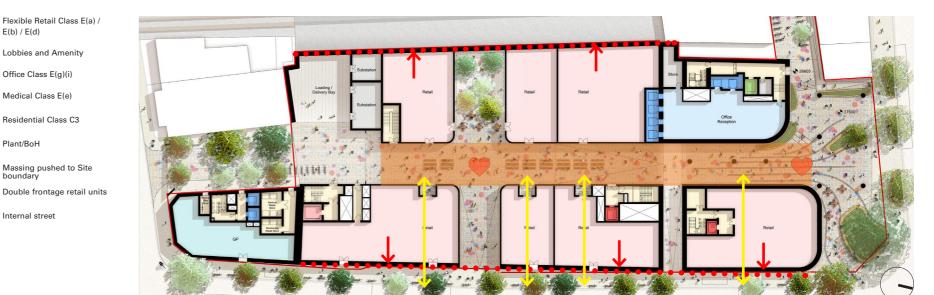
Illustrative Ground Floor Plan with Internal Street presented at QRP 2
